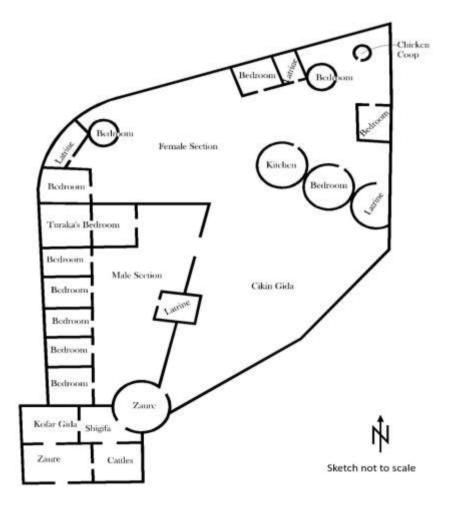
Typical family layout of the Hausa compound (Author, 2020)
